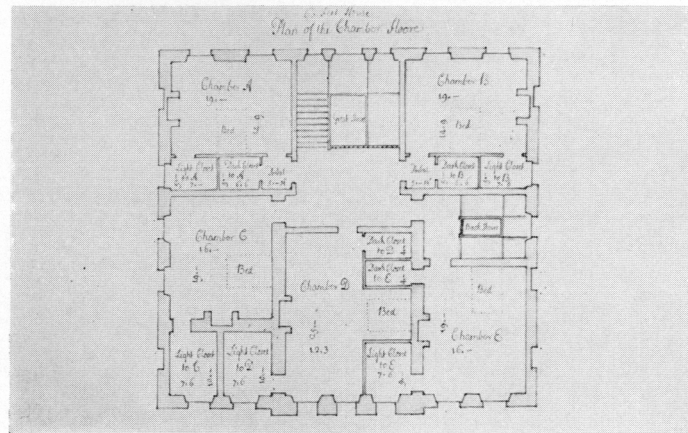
House at Henbury for Mr Fane, first floor plan [62]
